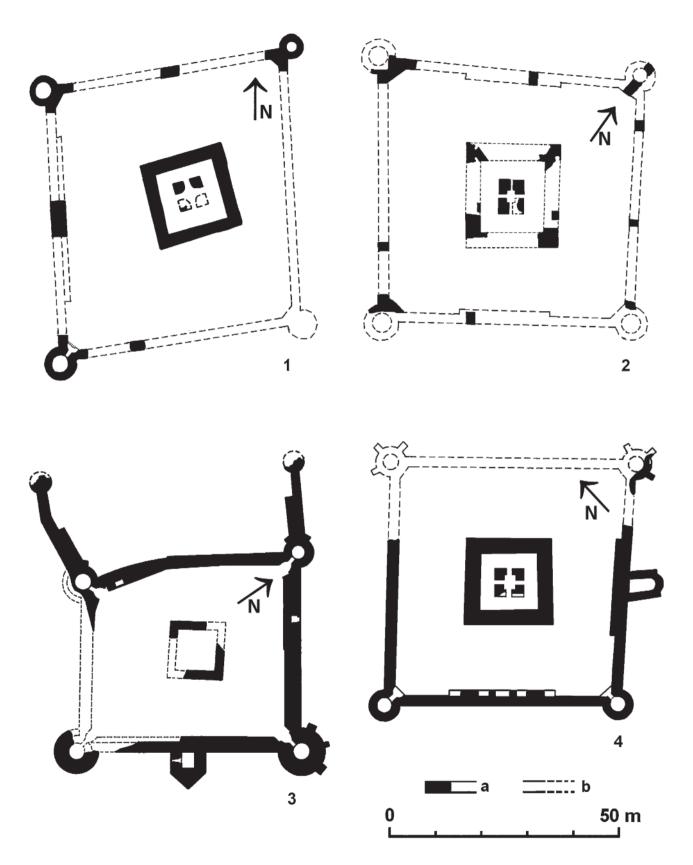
Fortlets built around earlier freestanding towers. Plans (a – certain course of walls; b – supposed course of walls): 1 – Rtkovo-Glamija; 2 – Ljubičevac; 3 – Hajdučka Vodenica; 4 – Donja Butorka (E. Jęczmienowski, based on: 1 – Gabričević 1986: plan I; 2 – Korać 1996: fig. 3; 3 – Jovanović 1984: fig. 1; 4 – Cermanović-Kuzmanović 1979: fig. 1).
